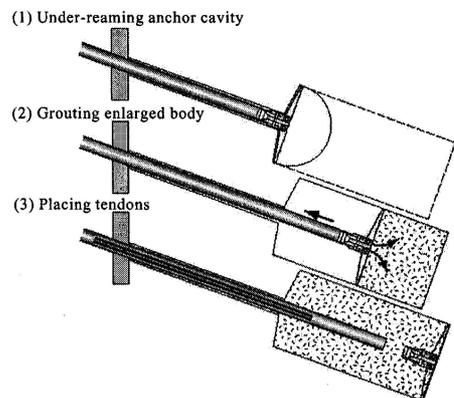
Construction sequence for splits anchors (Tamano *et al.*).
